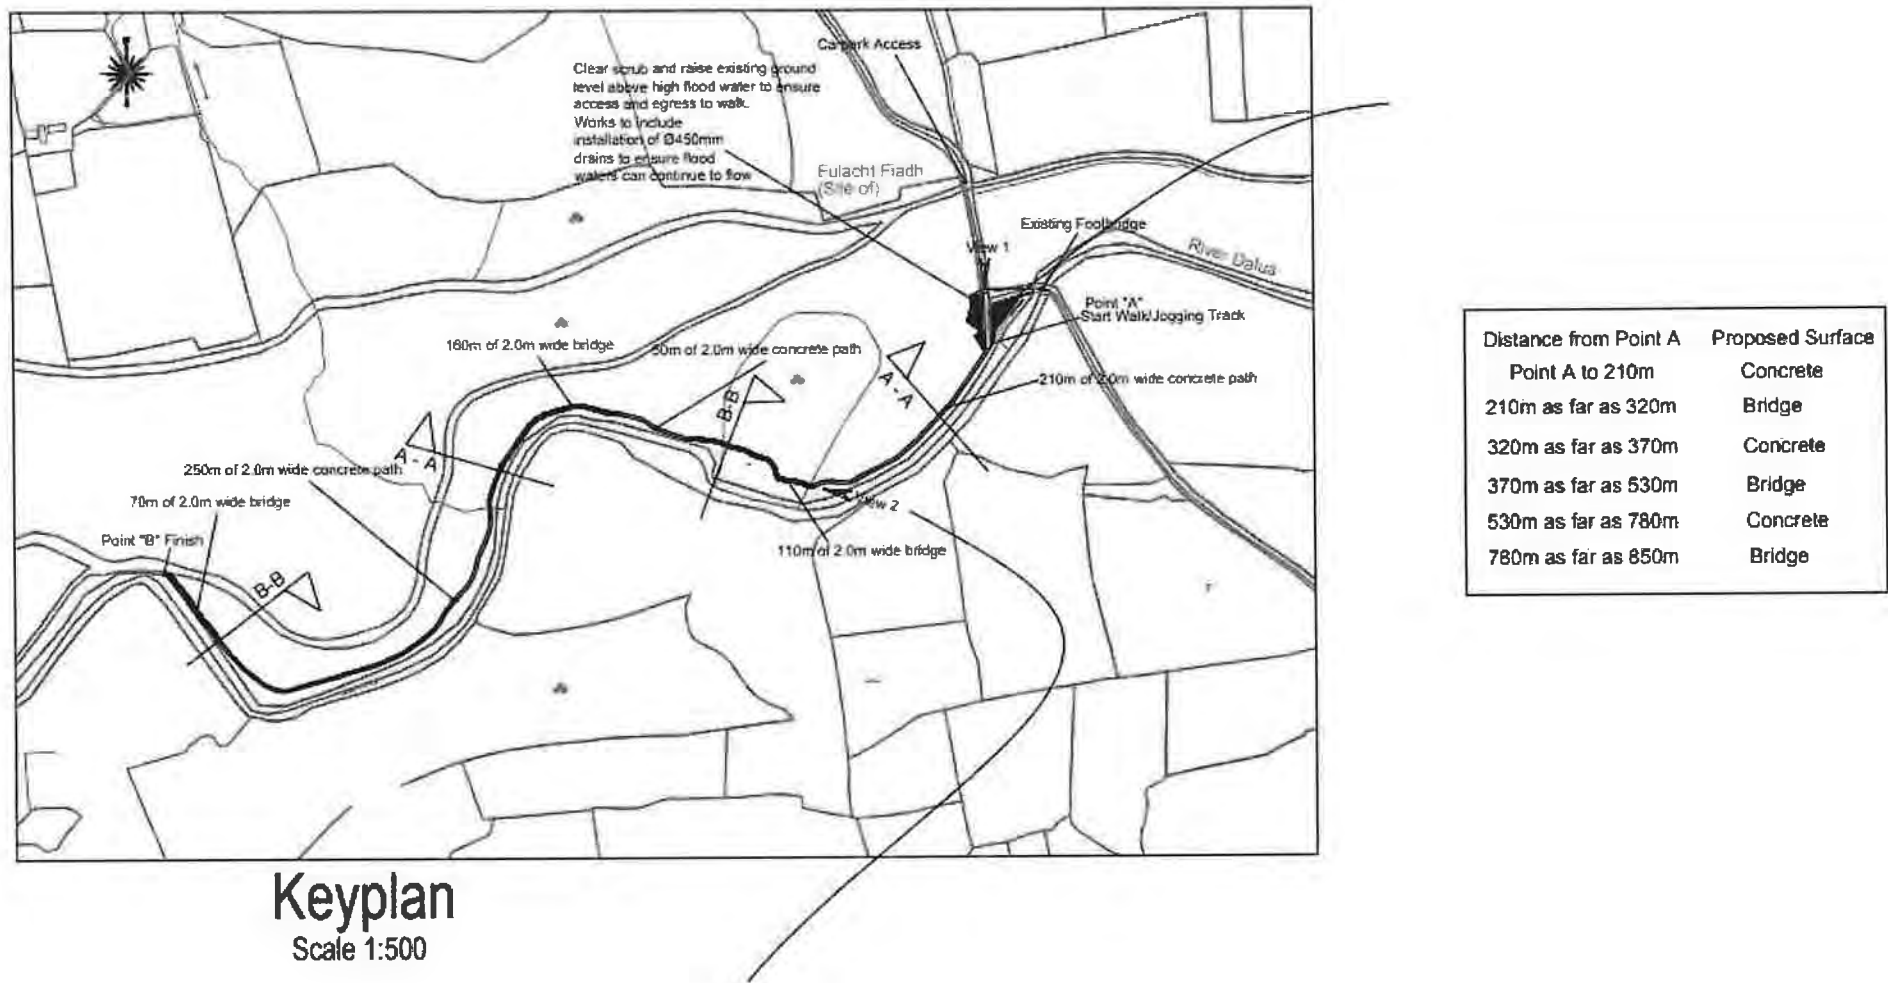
Map showing the path and the proposed re-surfacing and bridge locations.
